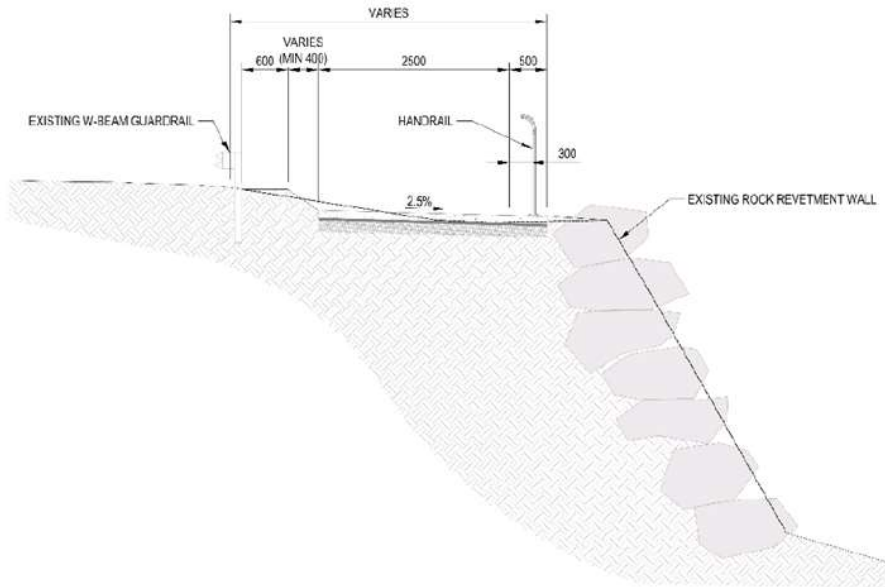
Typical cross-section in vicinity of existing stacked rock wall (from bridge to fishing platform)
